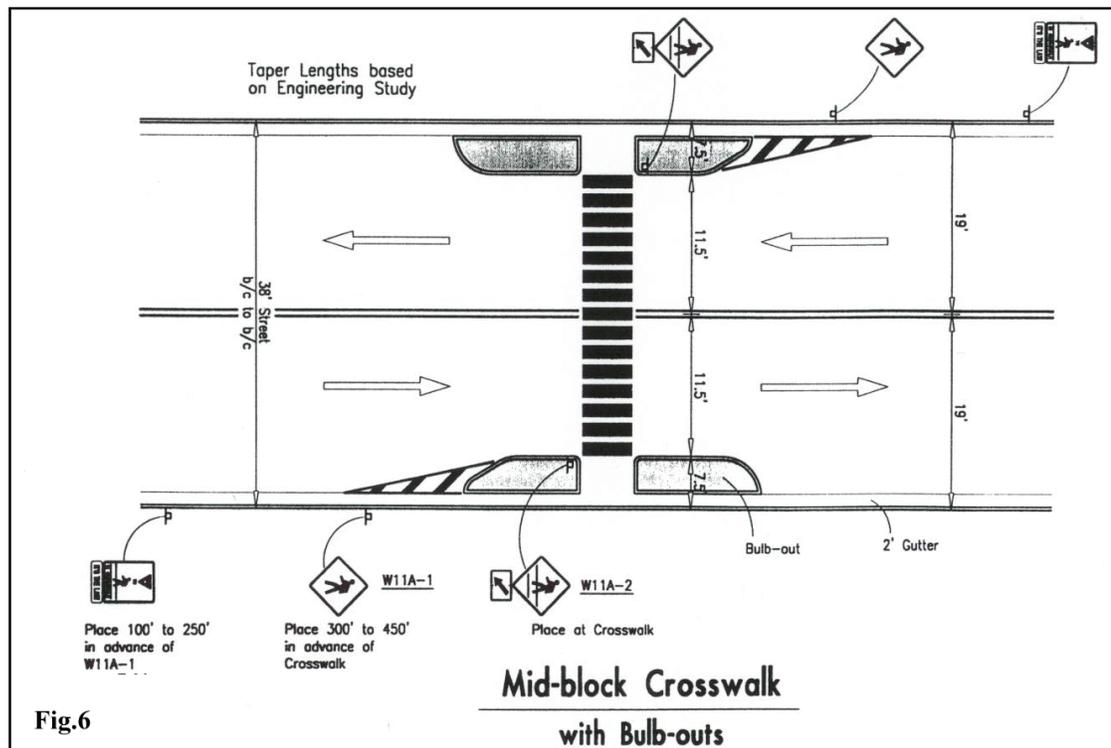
shows a typical mid-block crosswalk with bulb outs.
